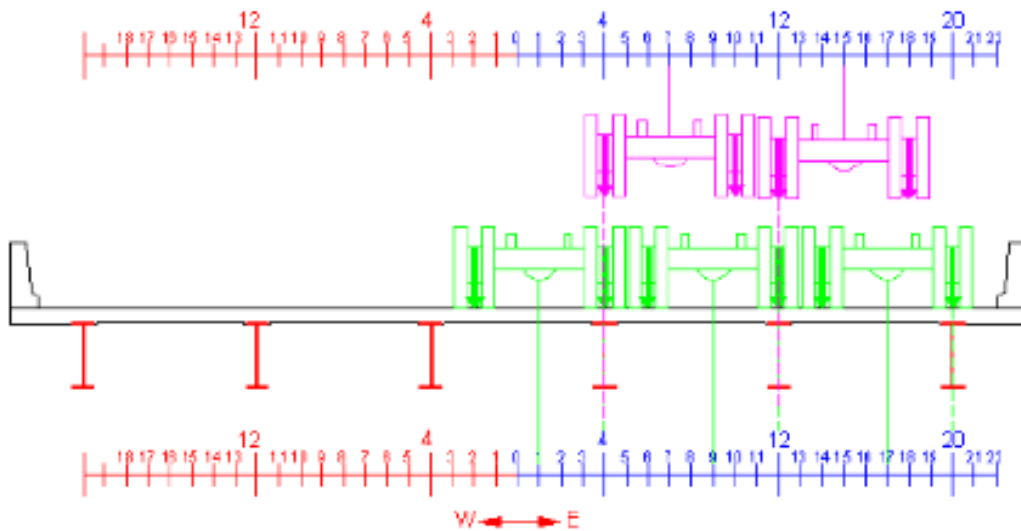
Transverse Truck Positions TR-1, 7, 9, 15, and 17 Loading Girders (Rhett 2012)
